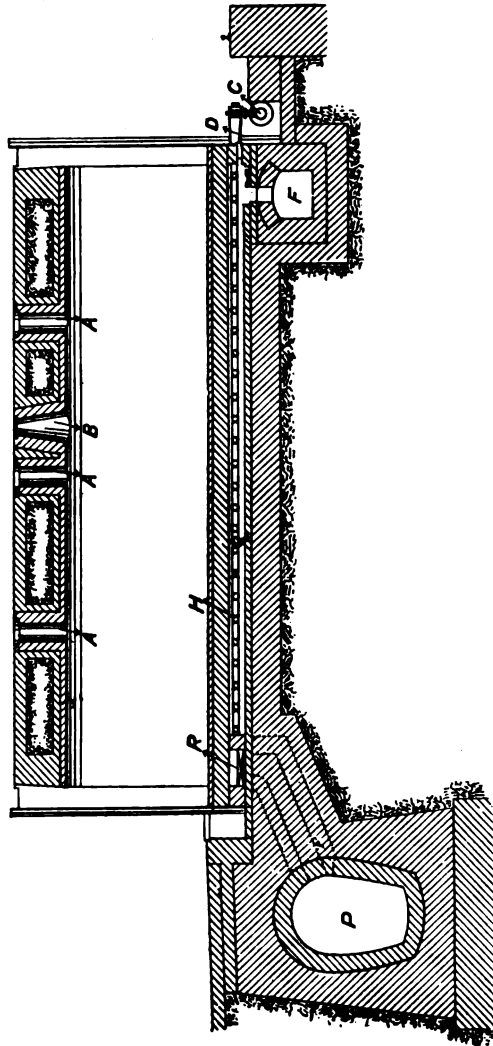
LONGITUDINAL SECTION THROUGH THE OVEN-CHAMBER.
